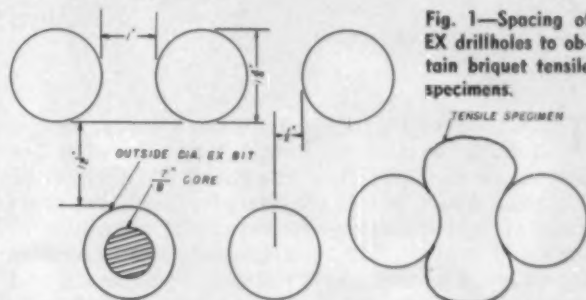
Spacing of EX drillholes to obtain briquet tensile specimens.
